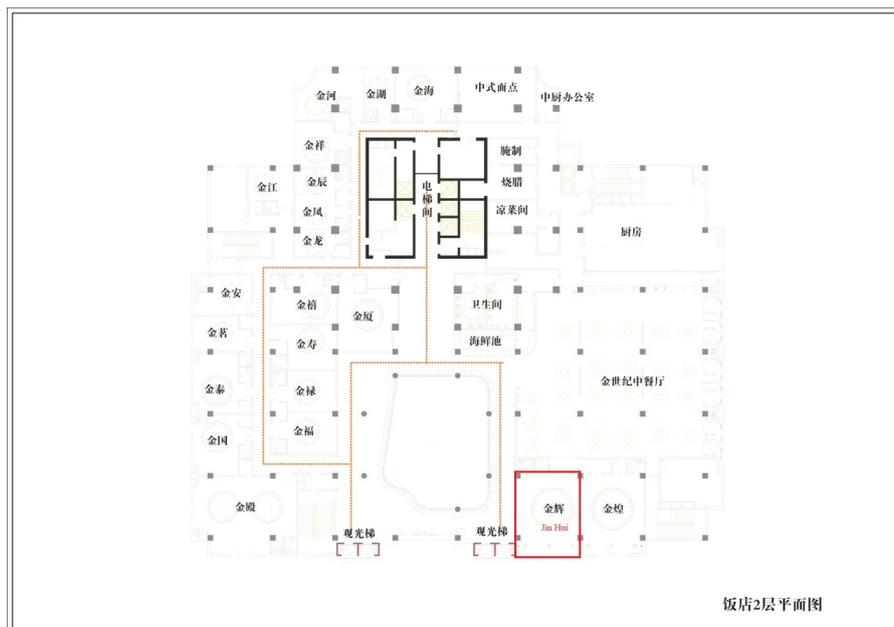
Floorplan of level 2 (JinHui banquet in red).
